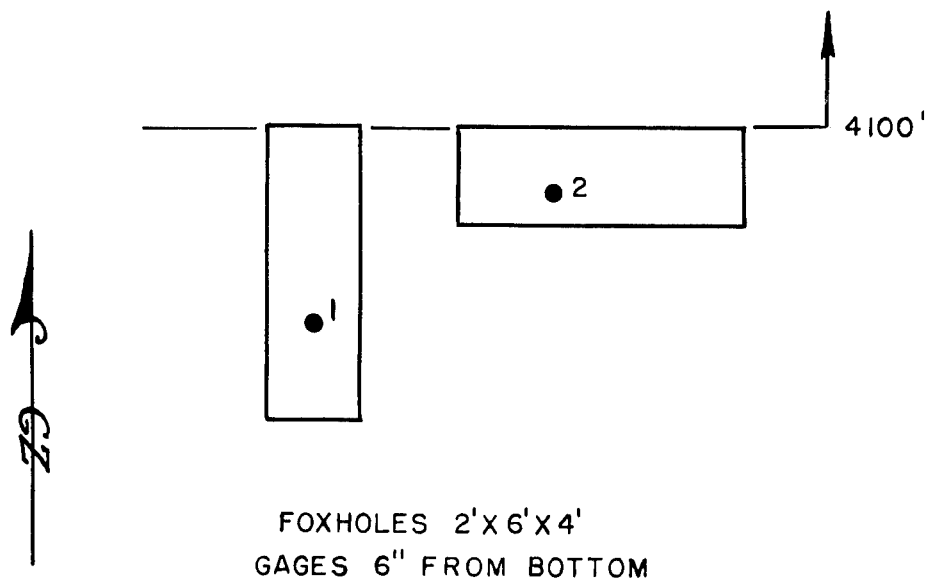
Gage Layout for Project 3.9 Foxholes
